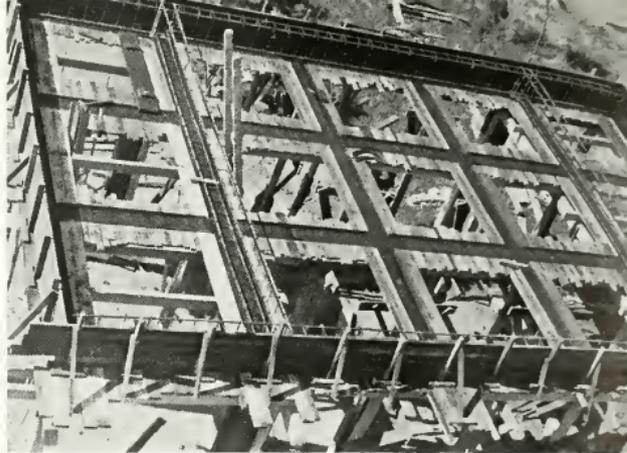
Reinforcing being placed in the test structure, 3 modules by 5 modules, two end modules cantilevered.
